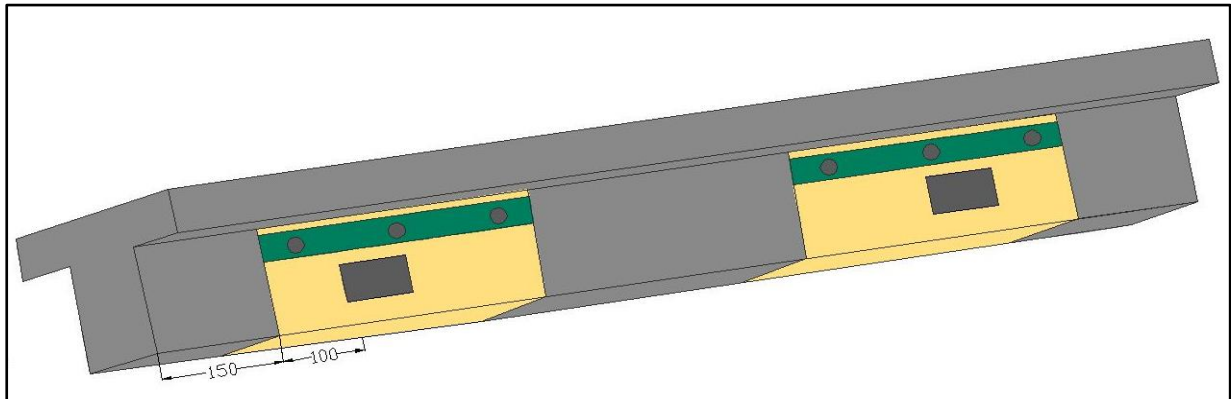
Model of beam with 4 layers of BFRP U-wrap in  $90^0$  orientation with rectangular web openings and anchorage system (SB16)
